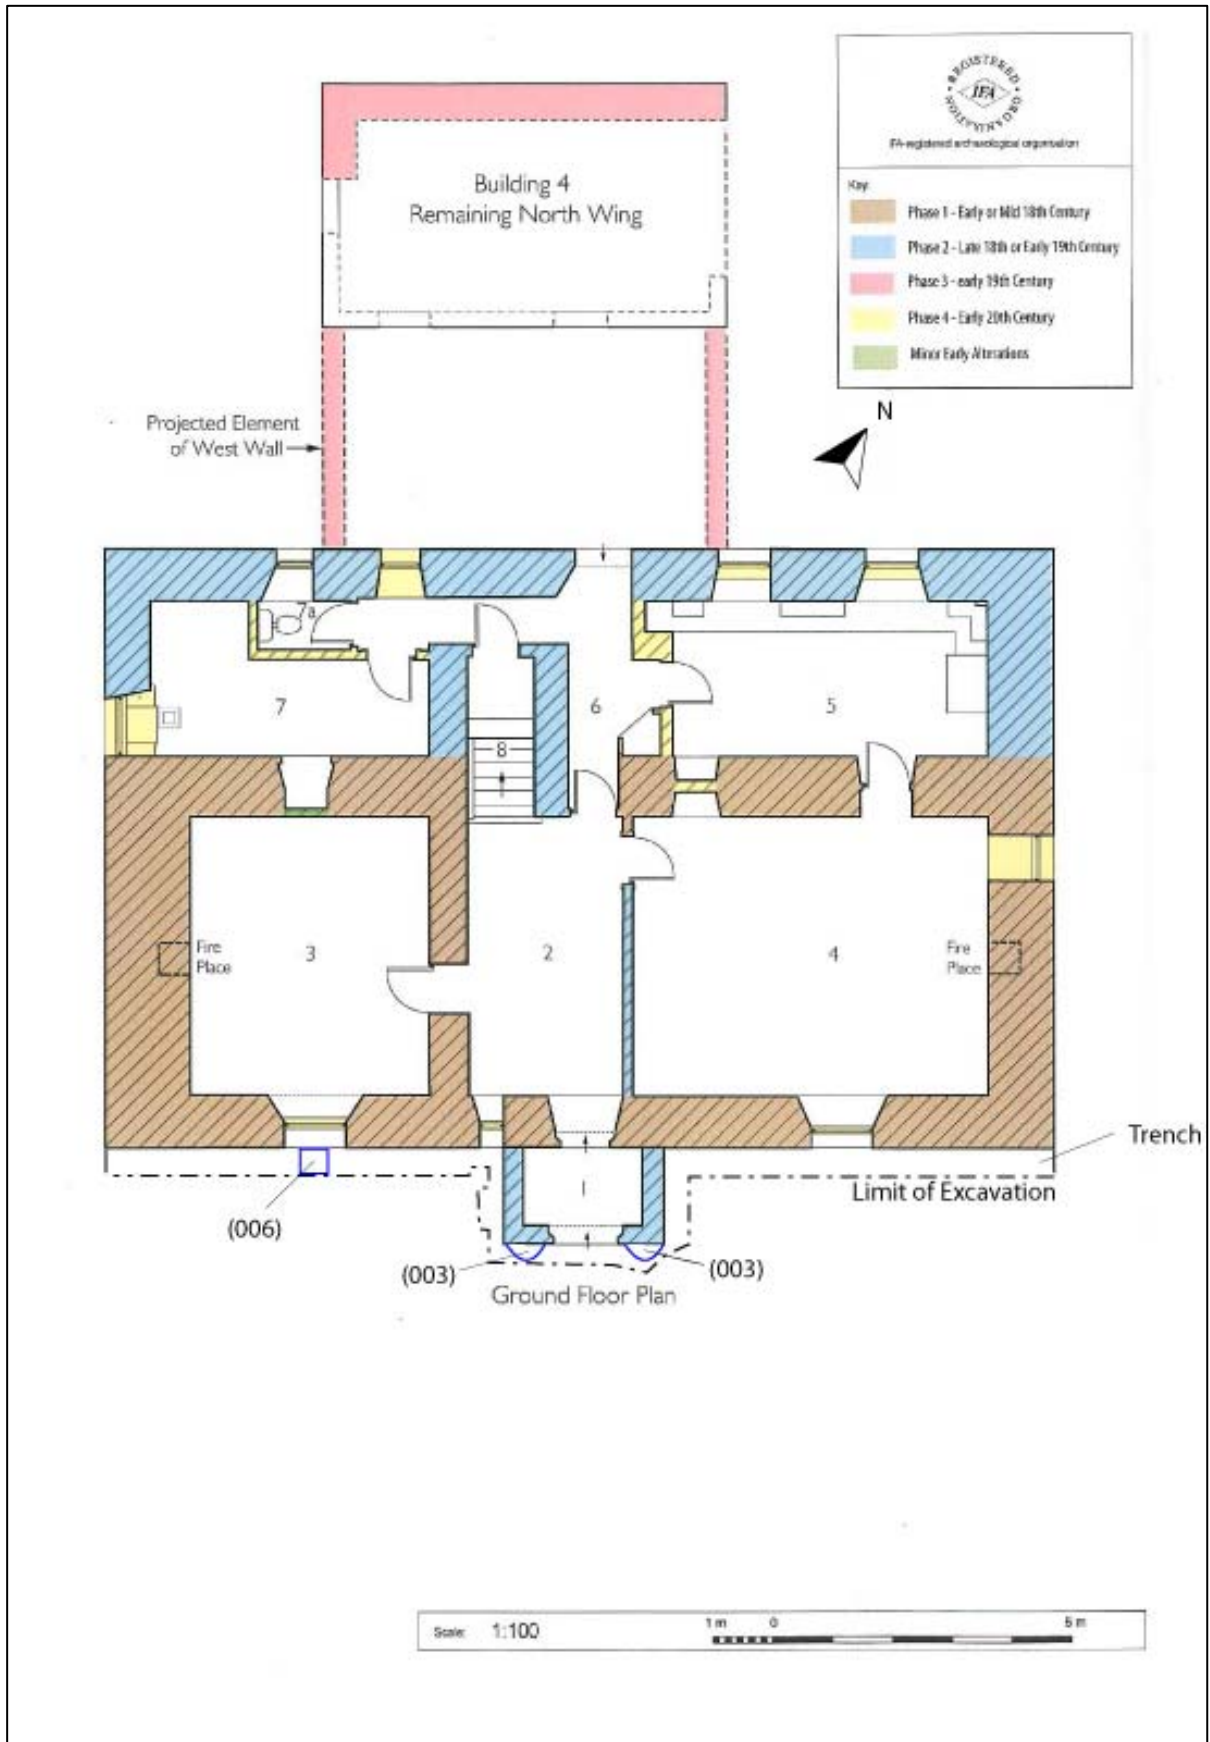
Plan showing location of excavated trench reproduced from Cressey & Richardson 2008, Fig. No. 8.
